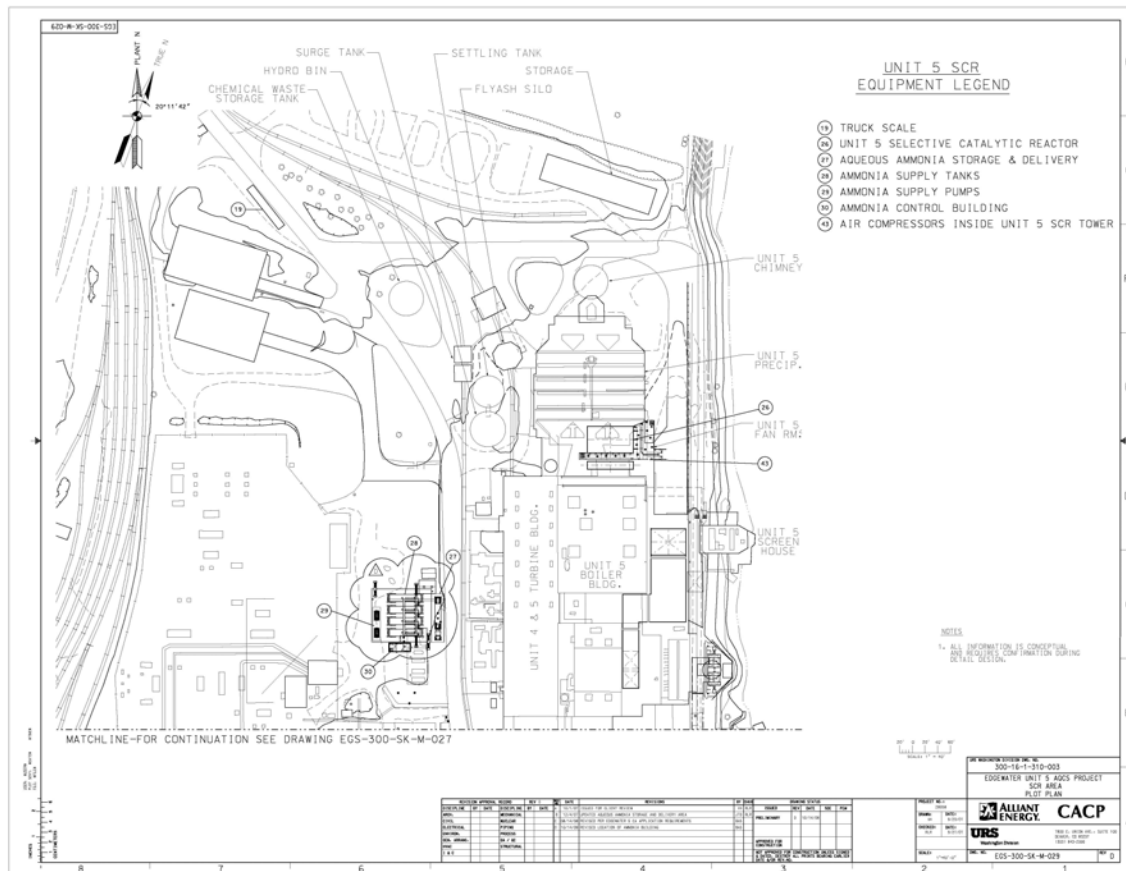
Site Layout – Proposed Edgewater Unit 5 SCR System
